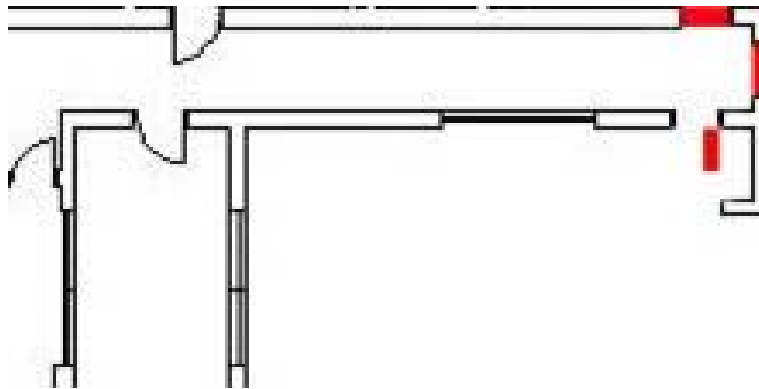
Modifications to the original floor plan to include the metallic details of the building
